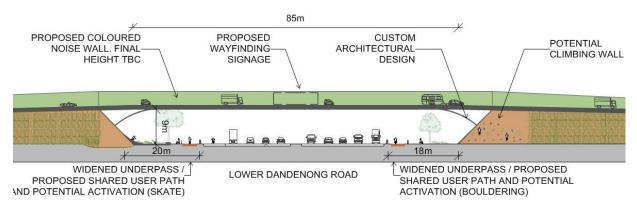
Cross section N Lower Dandenong Road looking east with non-standard mitigation measures
